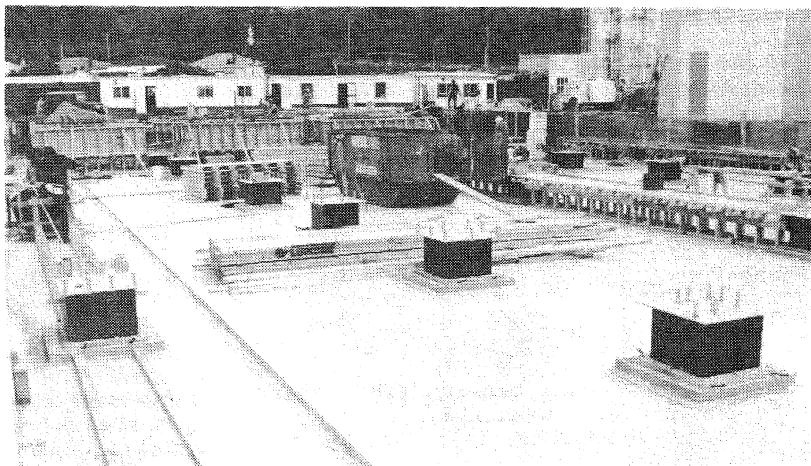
BEARINGS IN FOUNDATION OF THE WELLINGTON NEWSPAPERS LTD BUILDING, PETONE
